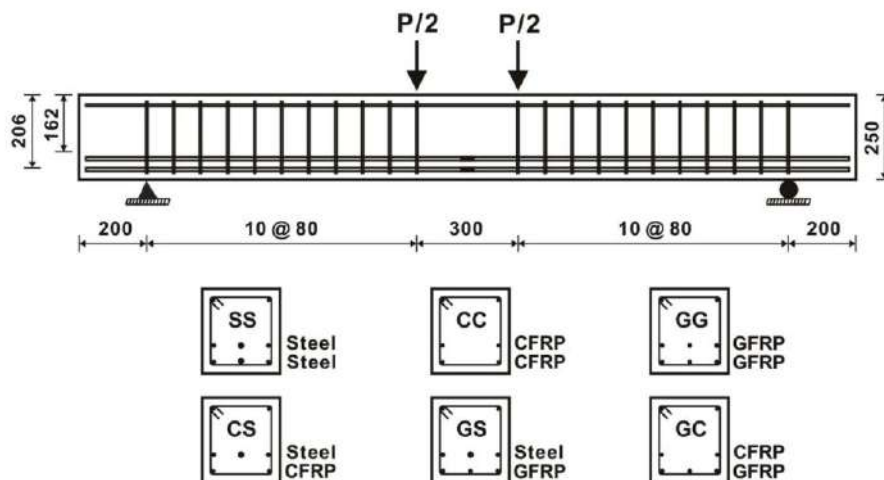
Details of test specimens (Yoon et al., 2011).
